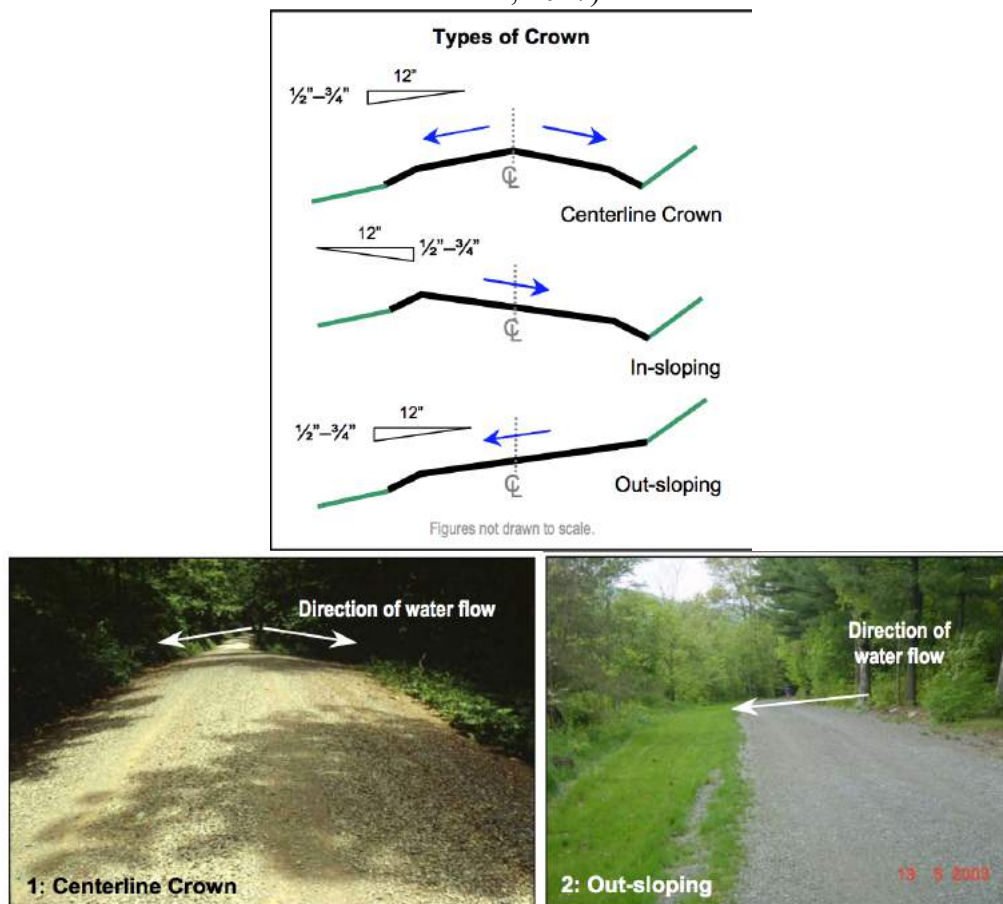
Crown and Cross-Slope cross sectional shapes of roads and trails used to drain water (PSU Center for Dirt & Gravel Studies, 2017)
